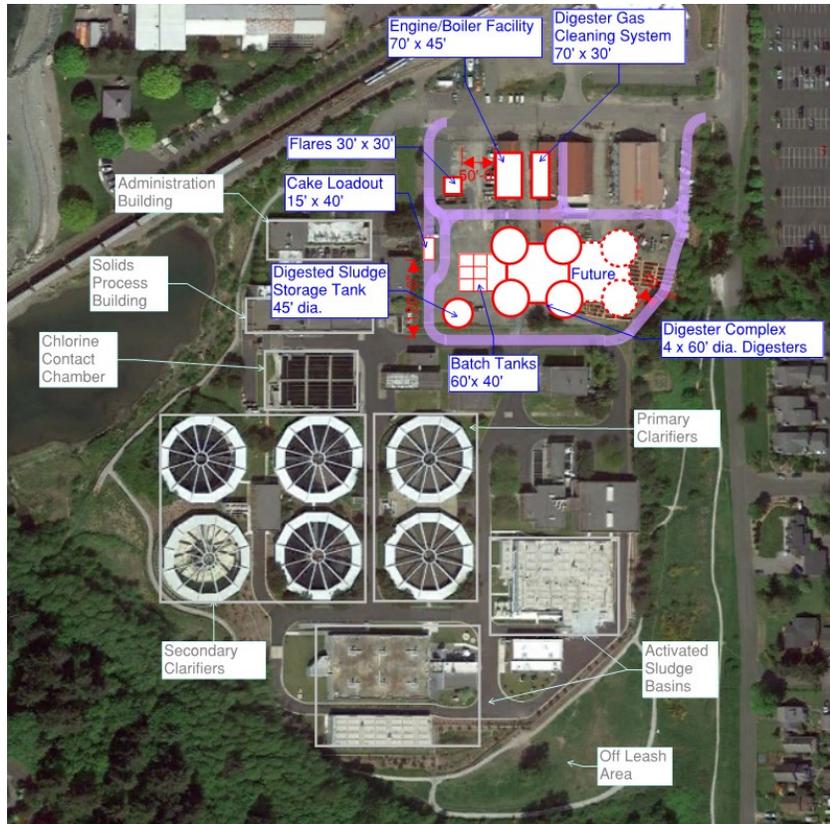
Conceptual site layout at Post Point for Alternative 3
